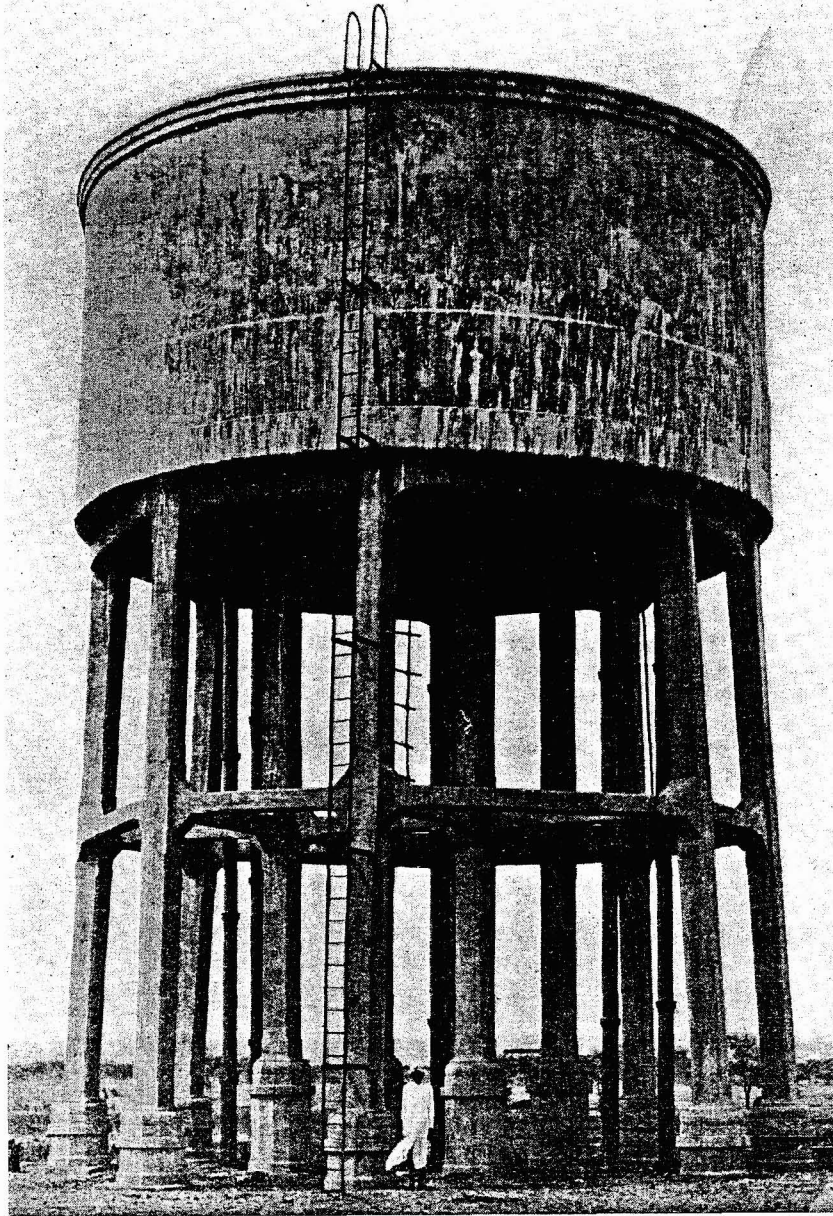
Water Tower at Yerada (from *Concrete and Constructional Engineering*, Oct. 1924).
